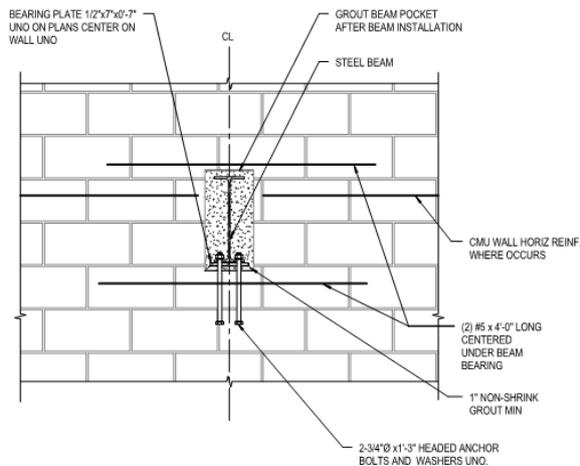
Bearing steel embeds on Concrete Masonry Wall.
